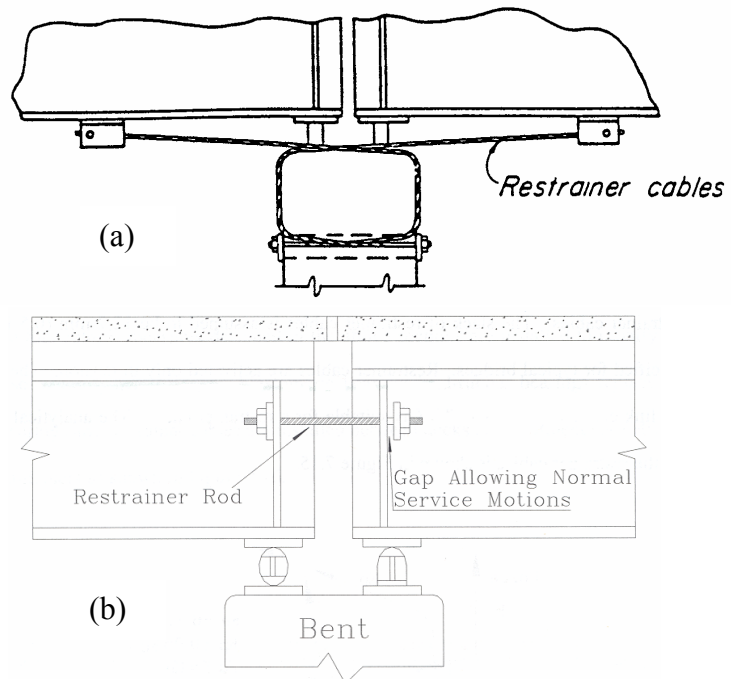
Restrainer connection in steel bridges: (a) between deck and pier; (b) deck to deck
